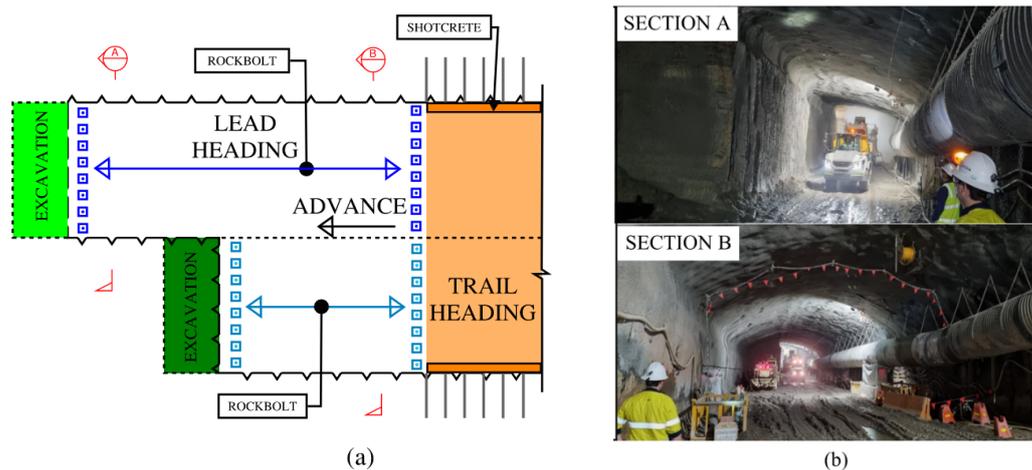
Project B (a) Plan showing typical sequential excavation sequence. (b) Lead and trail headings.
